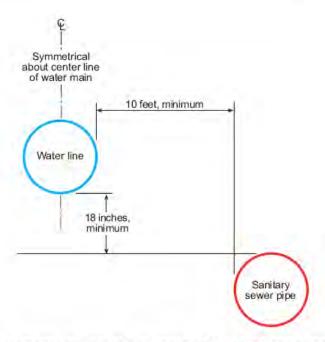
Required Separation Between Water Lines and Sanitary Sewers, Parallel Construction
